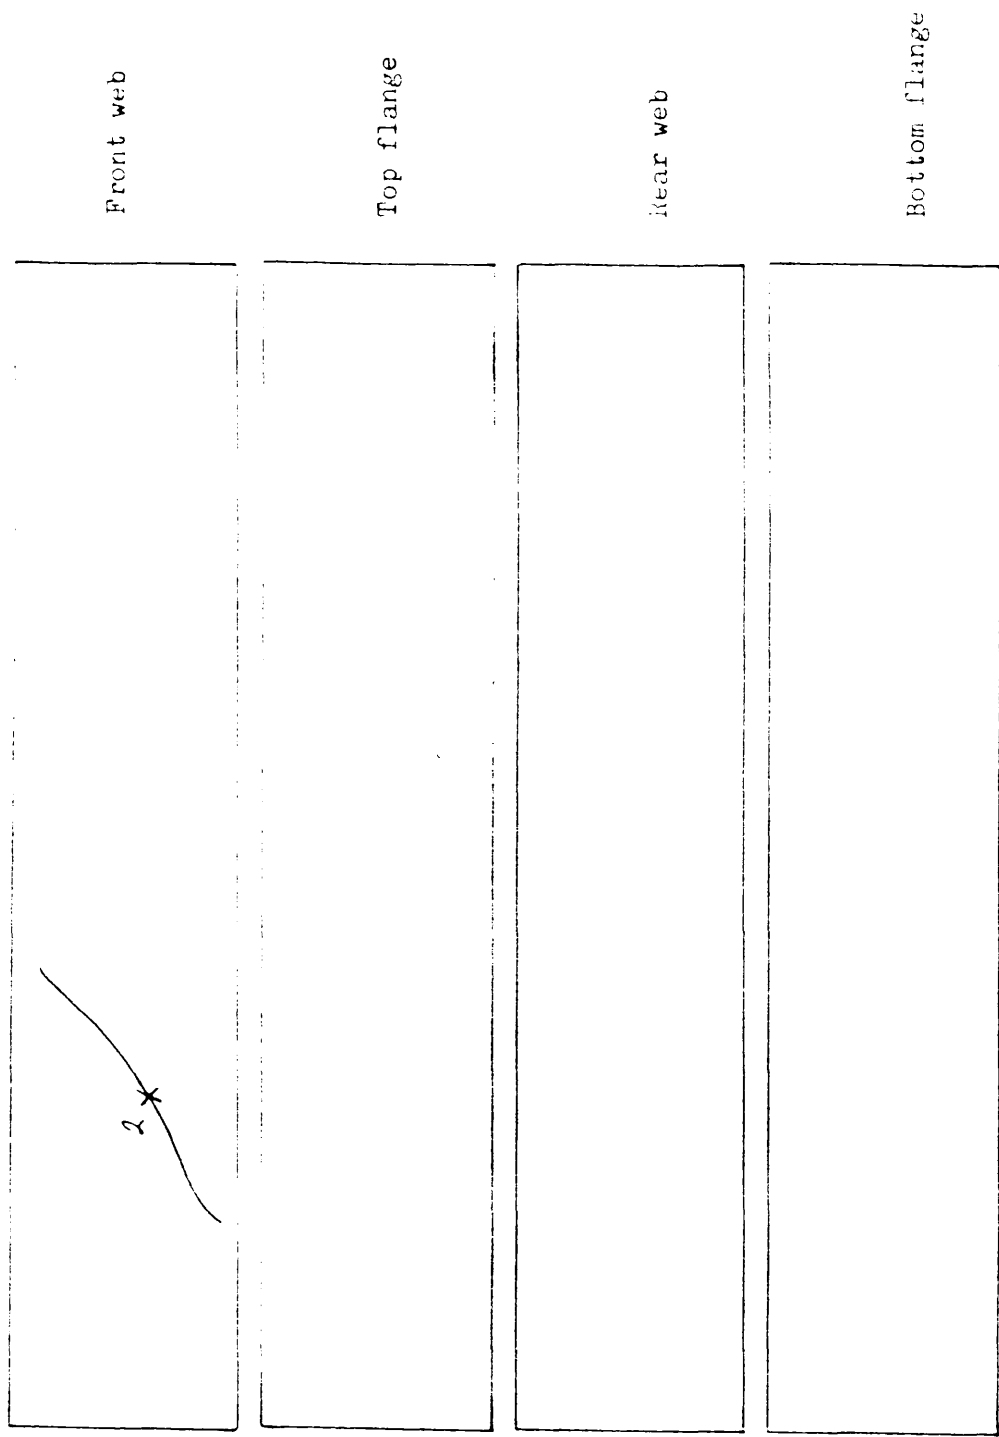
A Location of cracks where the measurement was taken for beam 24
